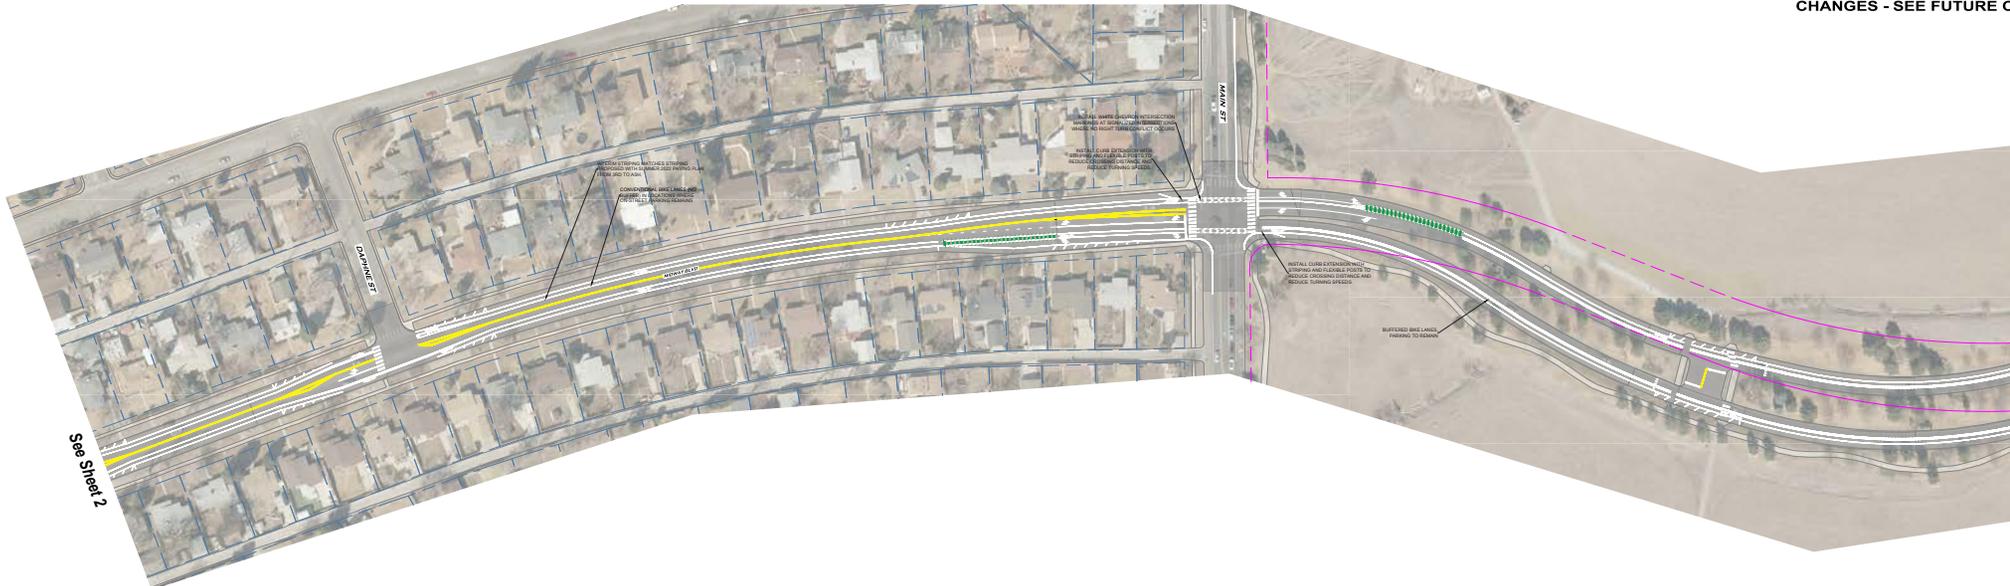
Interim Concept, Alter St to W 3rd Ave Dr
